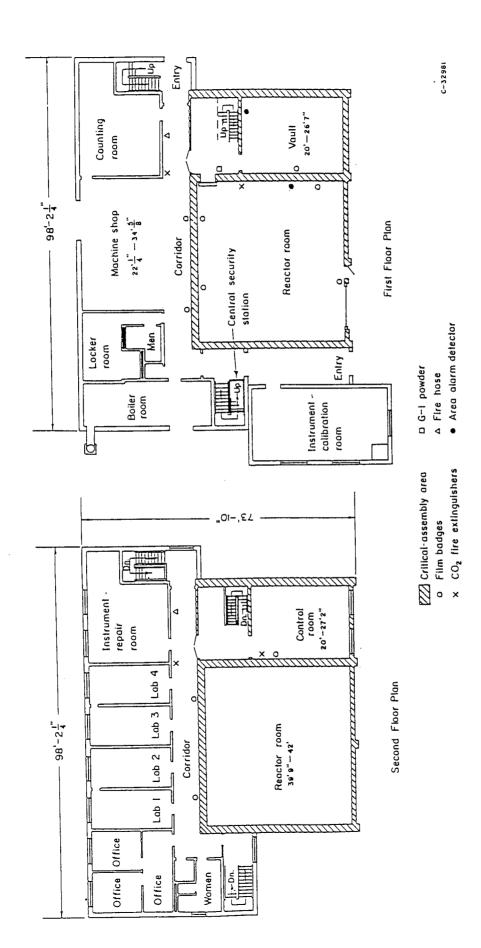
FLOOR PLAN CRITICAL ASSEMBLY LABORATORY
